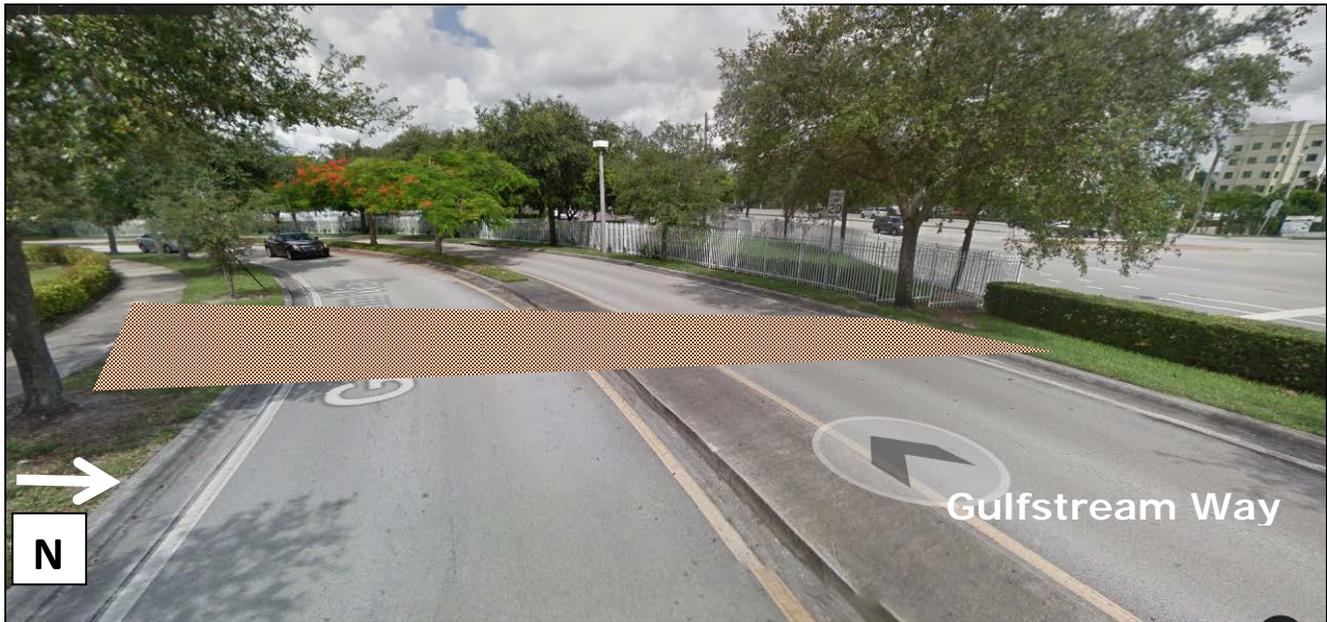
Direct Pedestrian Connection to Griffin Rd. (FLA1) – Construct a mid-block crossing connecting Griffin Road to existing sidewalk on south side of Gulfstream Way, with supporting sidewalk.
